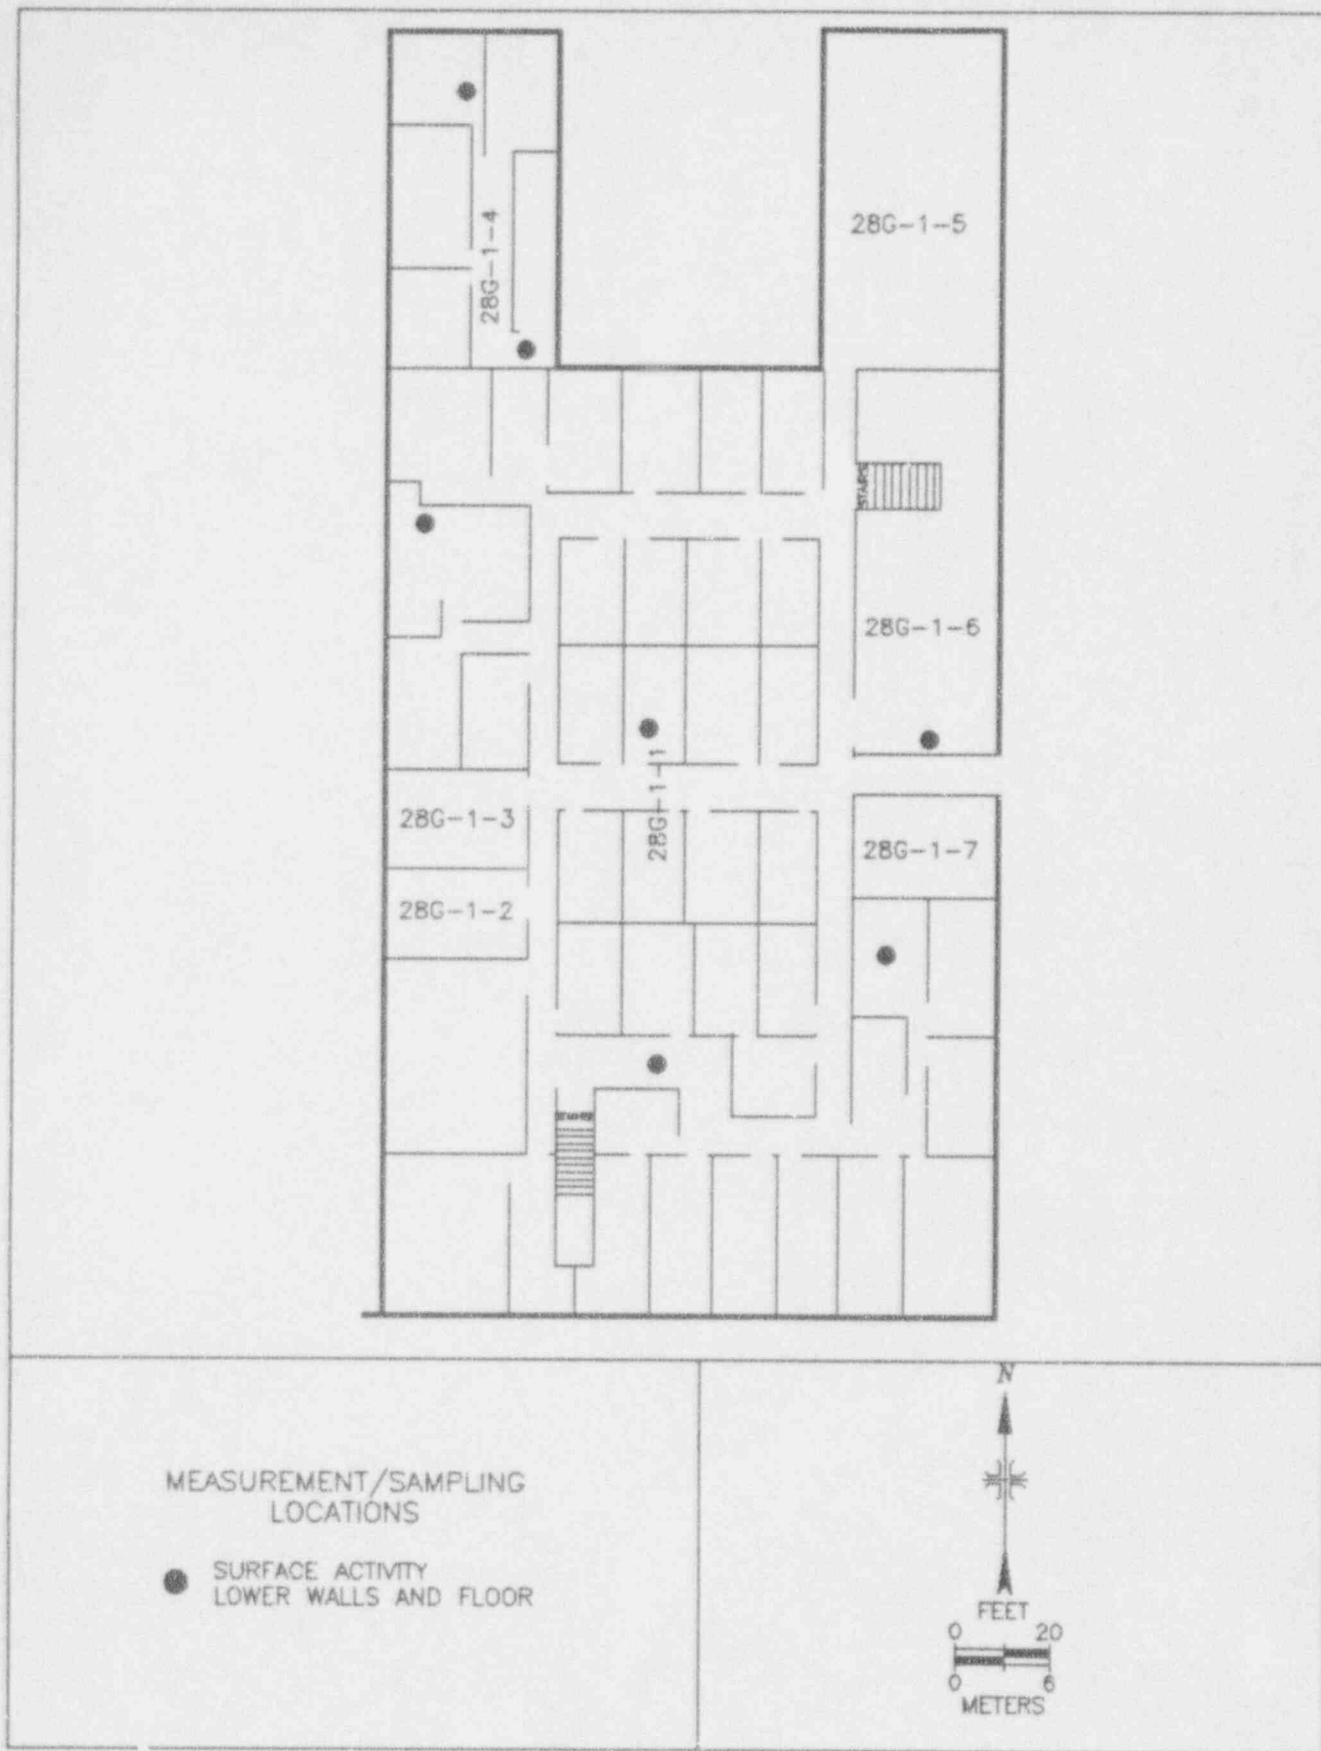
Building 9, Second Floor - Measurement and Sampling Locations
